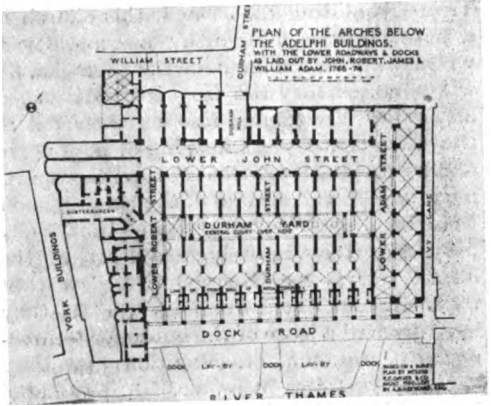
Plan of the Arches below the Adelphi Buildings.
